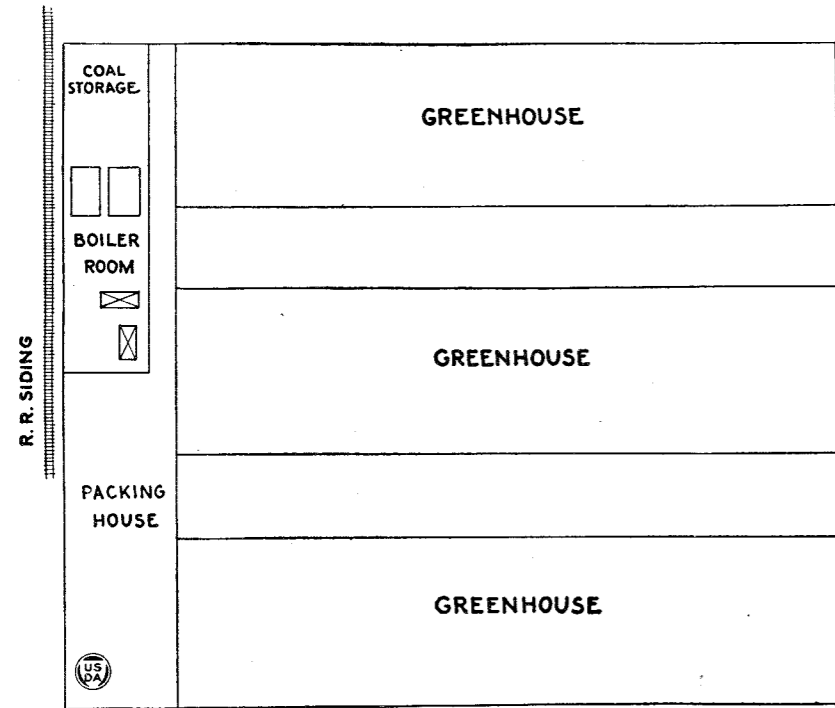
Detached greenhouses with head house across one end; such a plan is often employed in building ranges of greenhouses. This arrangement facilitates the economical handling of the work.
